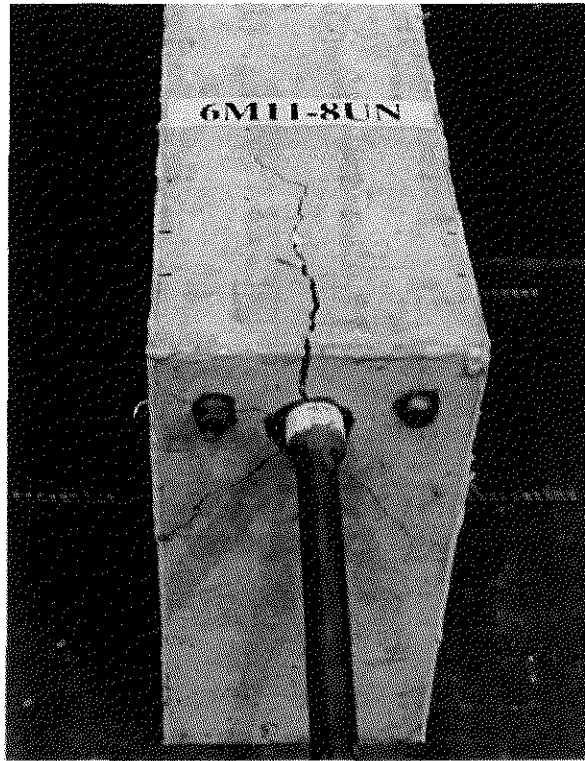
Beam-end test specimen without transverse stirrups after failure. Cracks on the front face of specimen below the bar form an inverted V
